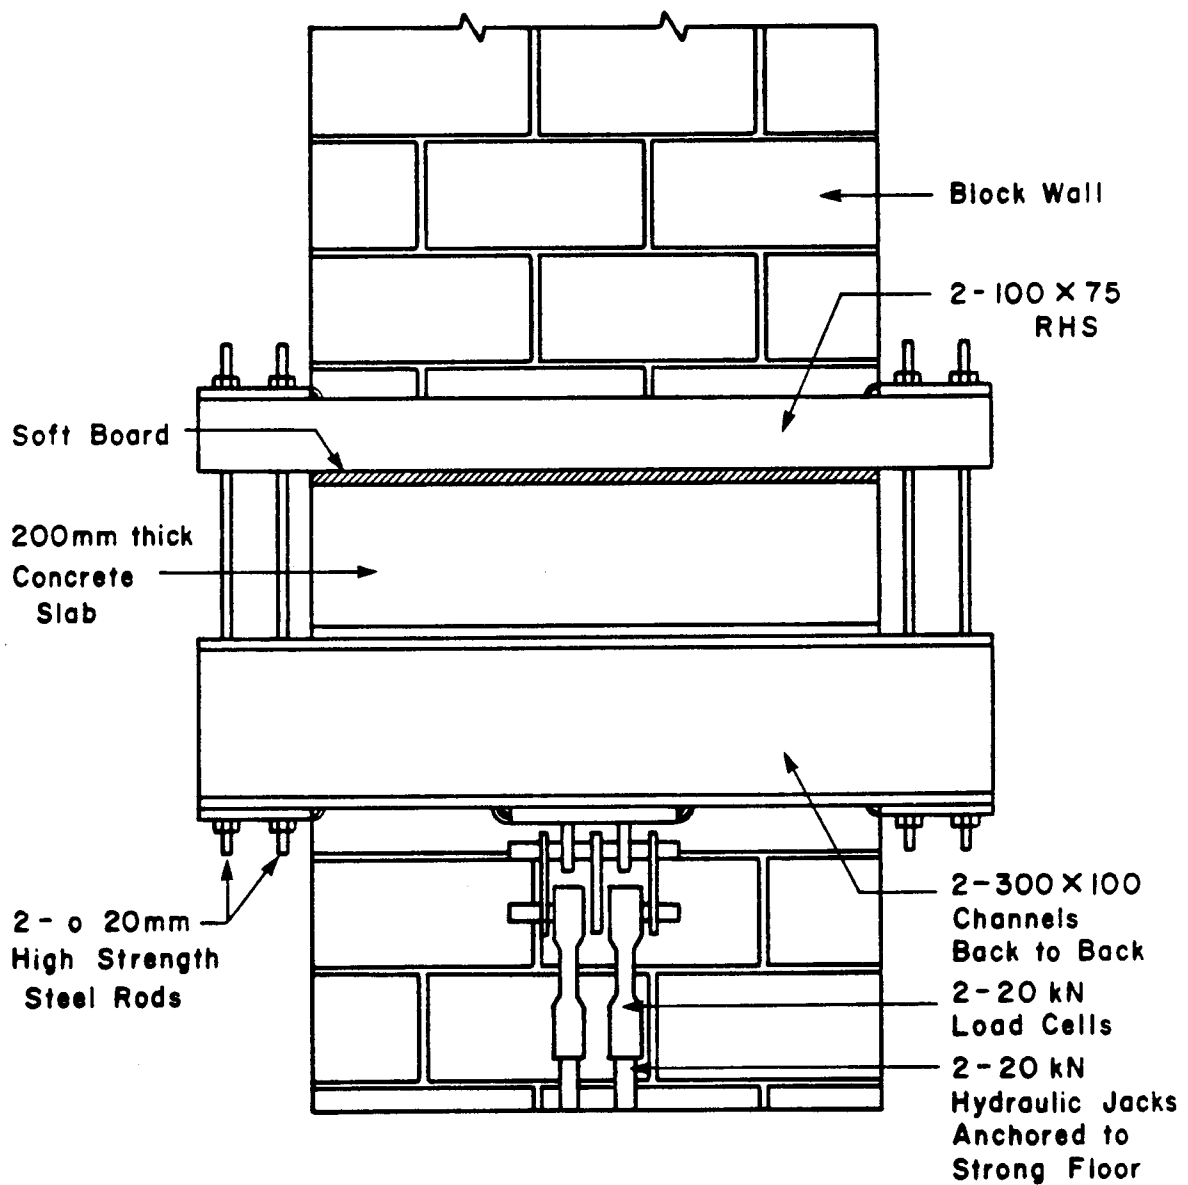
Slab Loading Apparatus for Type I Specimens
